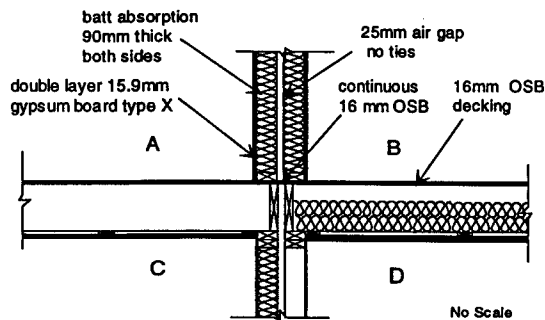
Vertical section through the construction specimen showing the fire stop formed by the continuous floor decking and the superior A-B party wall.
